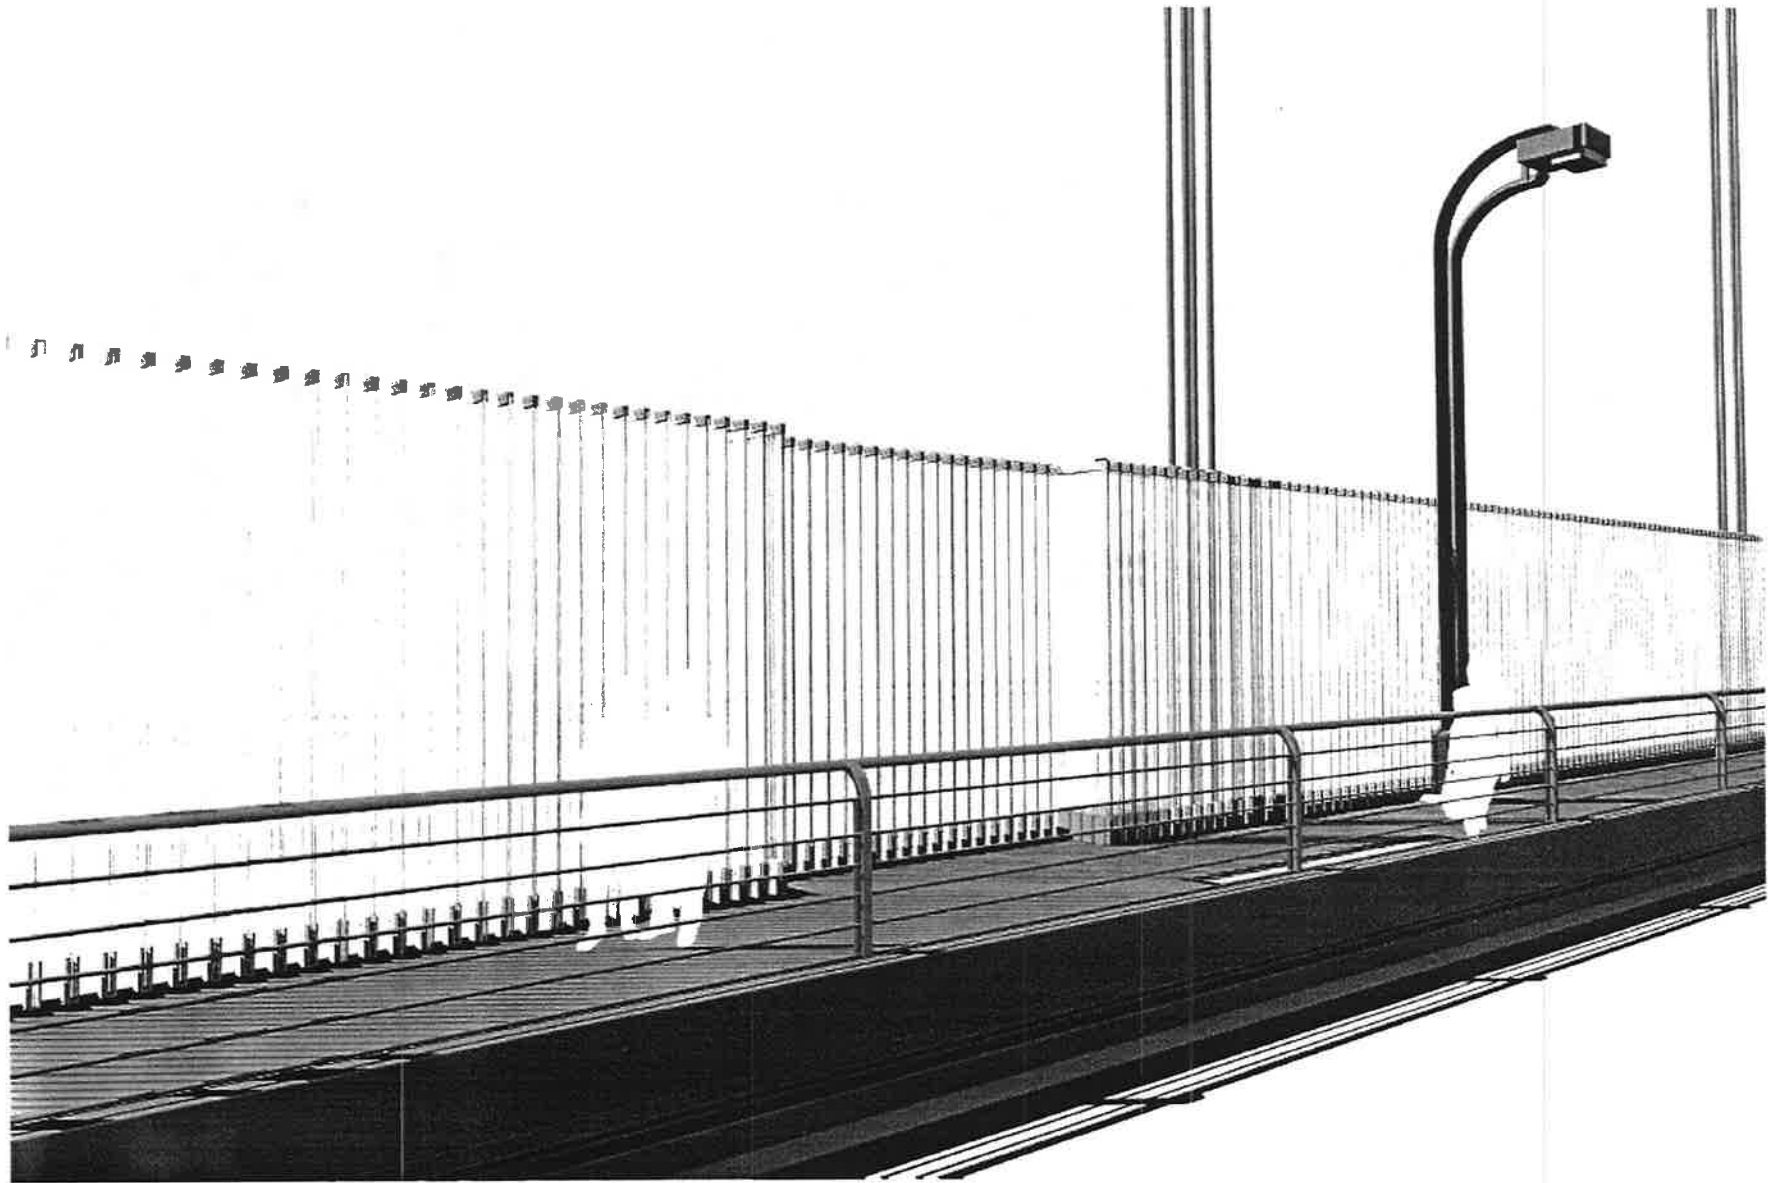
EXAMPLE OF CONCEPT 2 (EXAMPLE SHOWN WITH HEIGHT OF 12'-0", NO WINGLET; WIND FAIRINGS ON TRUSS AND SIDEWALK, VERTICAL GLASS PICKETS SPACED AT 7", SOLID RATIO OF 23%) *VIEW FROM ROADWAY
